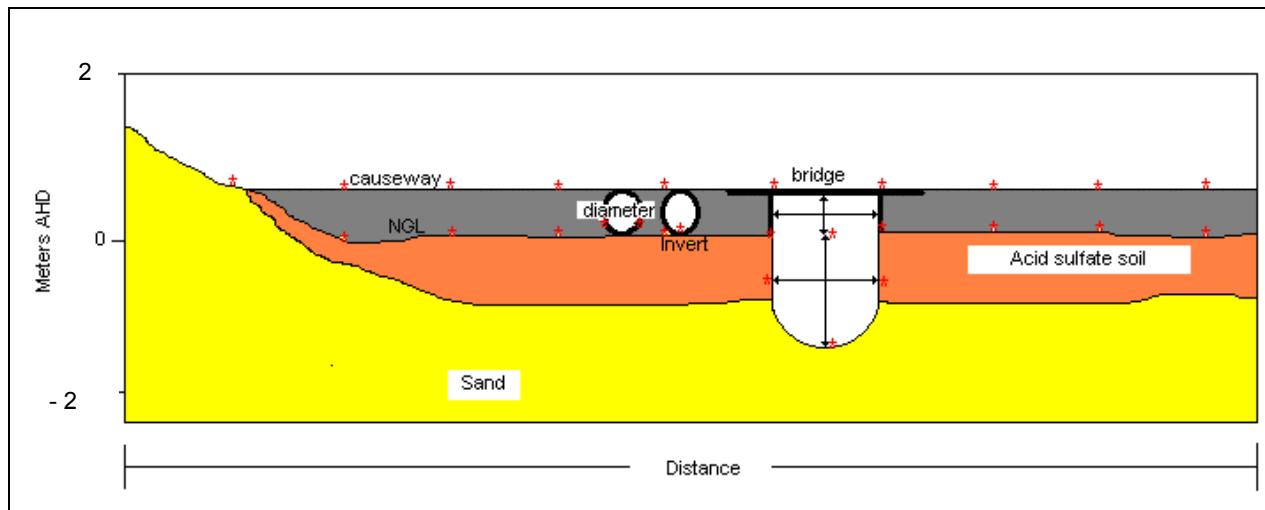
Sample section of Darawakh floodway illustrating elevation survey
